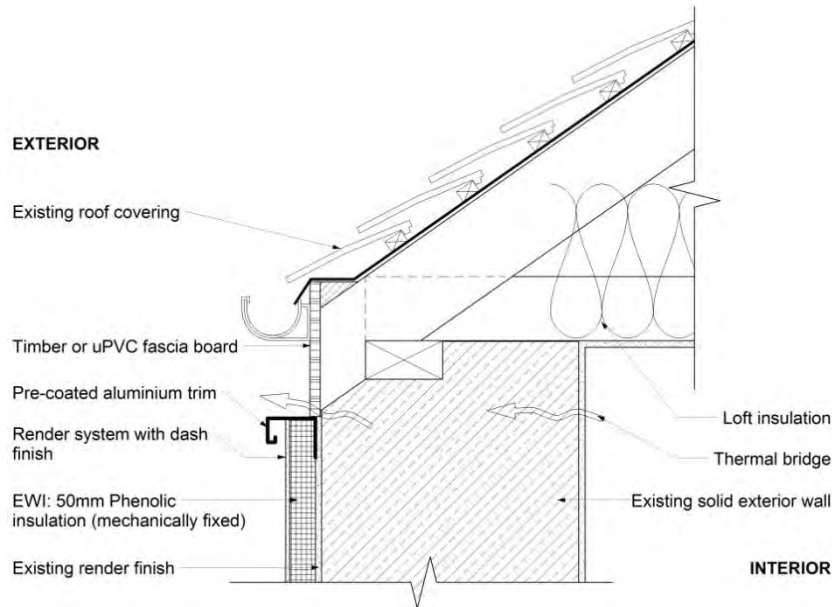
Eaves detail as observed on site (Source: Hopper *et al* 2012b)
